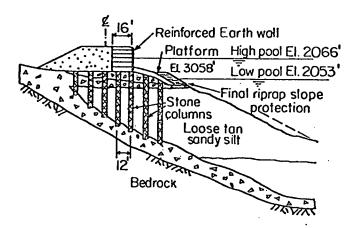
Reinforced Earth and stone columns, Lake Pend Oreille, Idaho.
